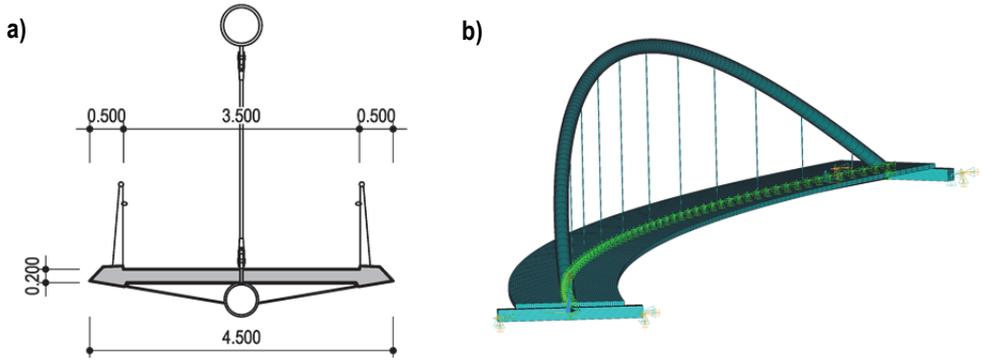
Bridge suspended on the curved arch – a) cross section, b) calculation model
